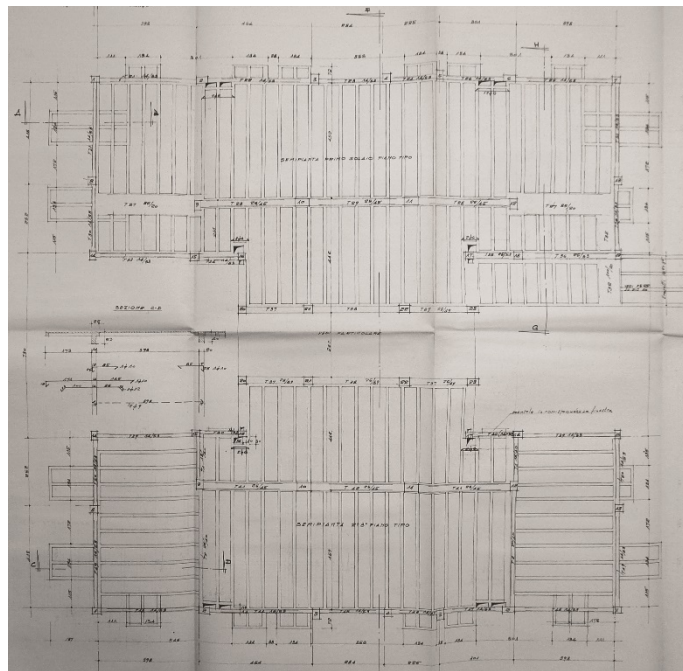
Floors' bottom structural plan (detail 1:50) adopted in blocks B1 and B4 by Saicca (AST, 1)
